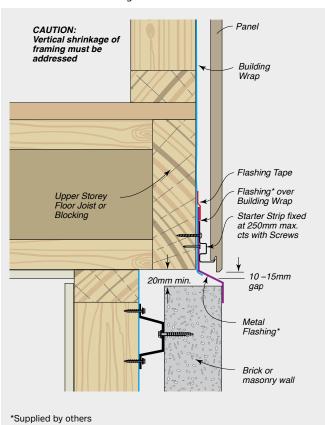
Typical Junction with Offset Masonry Wall - Plan View
